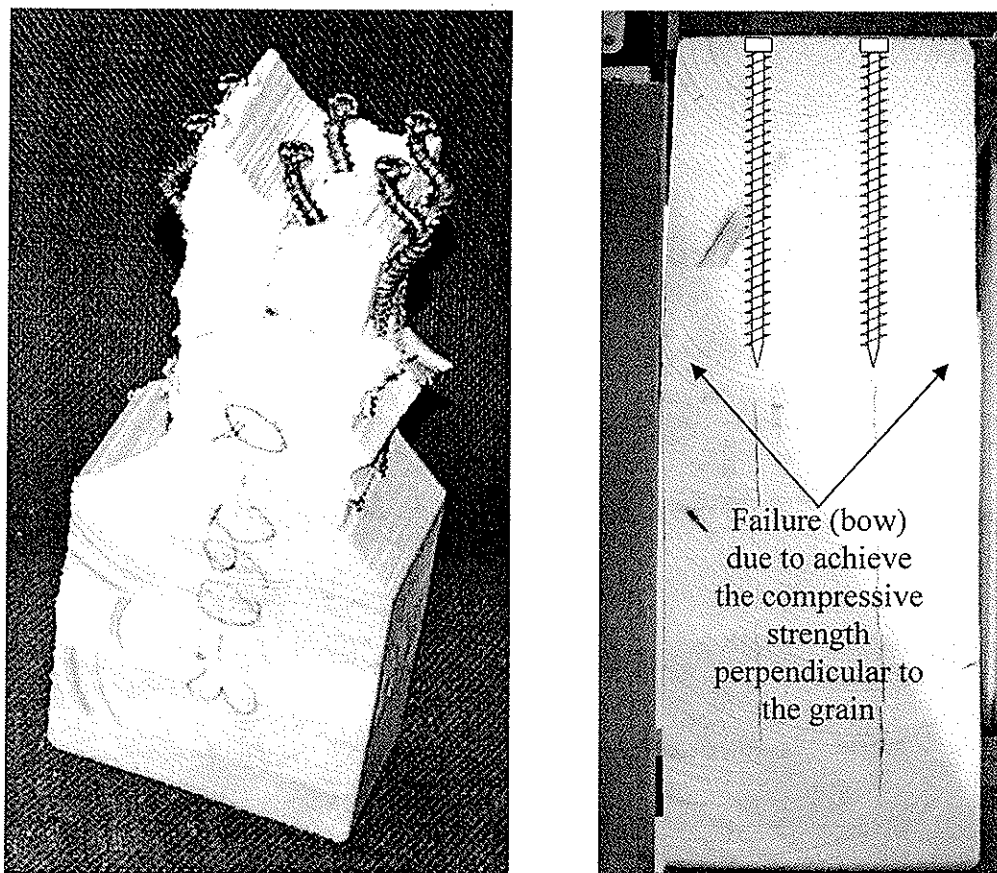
Buckling of the screws and timber failure in a plane formed by the screw tips
